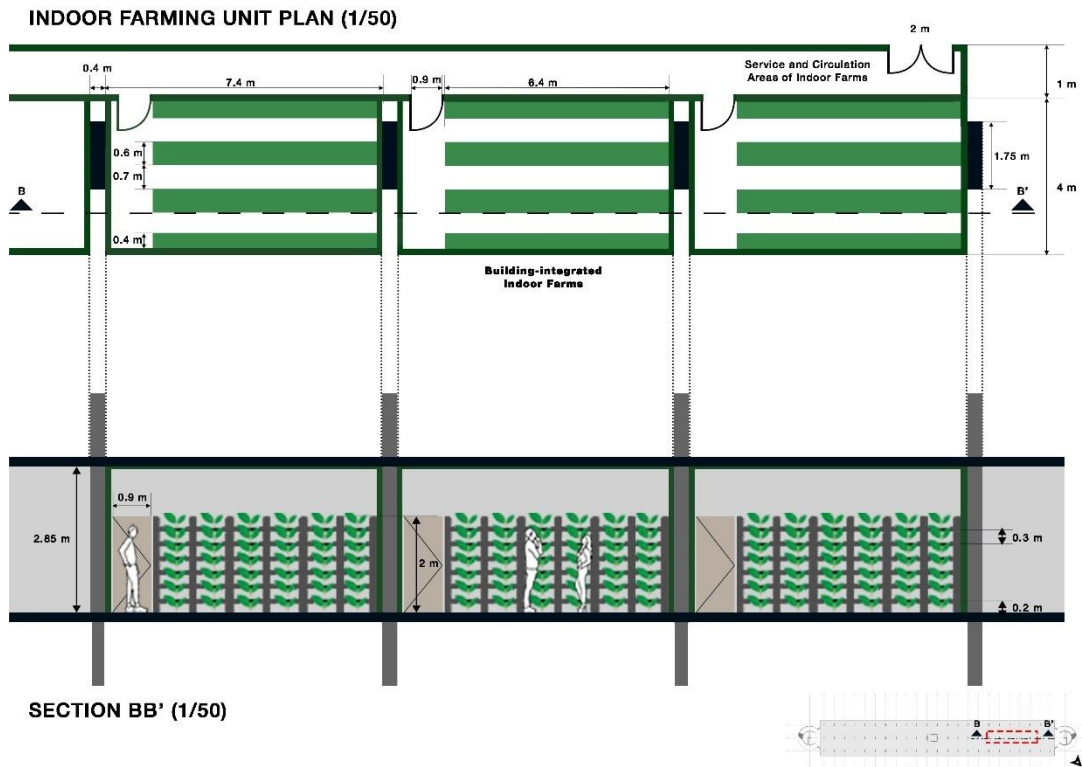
Indoor farming unit plan and section BB' for the transformation project.
